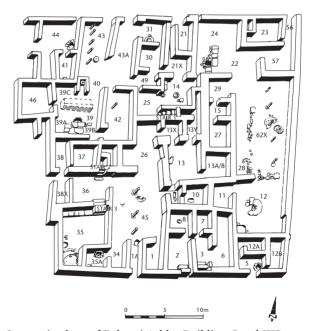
Isometric plans of Enkomi Ashlar Building: Level IIIB.
